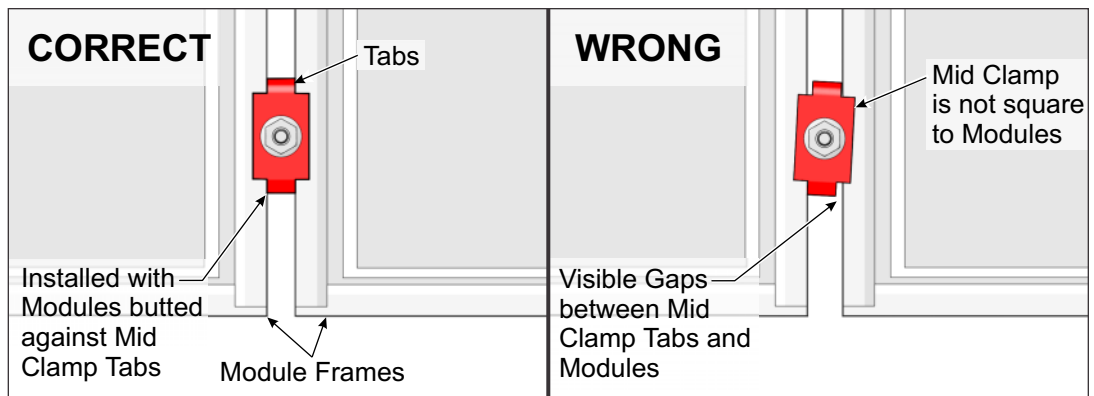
Correct and Wrong methods of installing a Mid Clamp (using Carriage or RAD Bolts)
